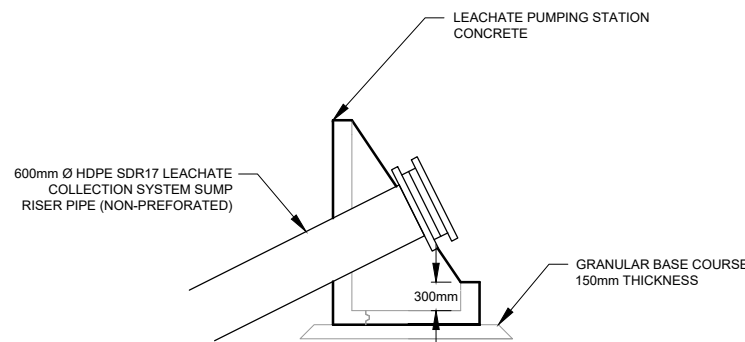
LEACHATE COLLECTION SYSTEM SUMP
